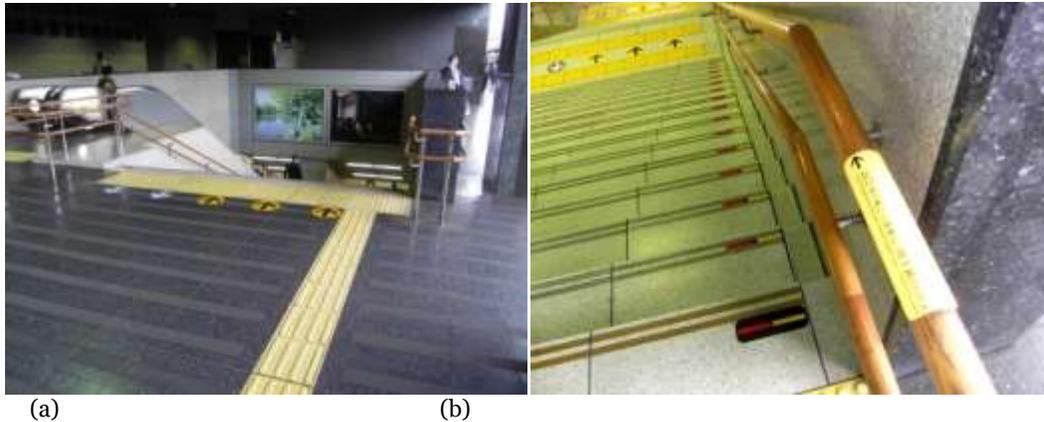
(a) Contrasting tactile tiles at Kyoto station; (b) Braille stickers on staircase handrail at Kyoto Station
